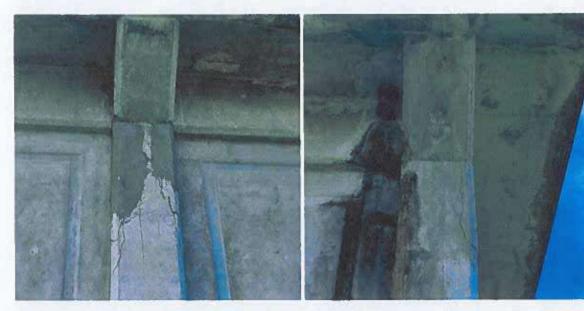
Concrete Spalls to be Repaired (North Elevation)
